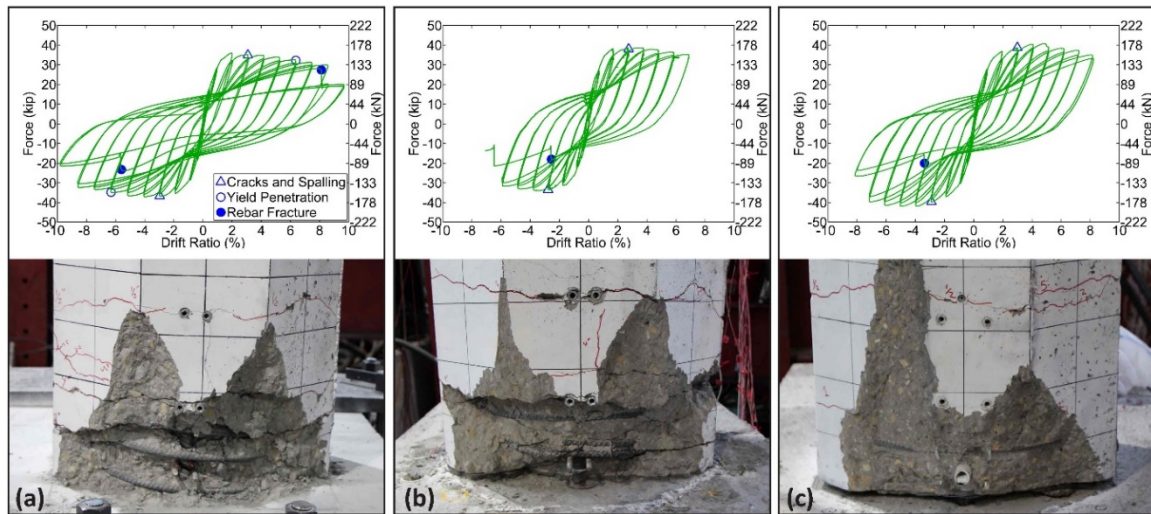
Hysteretic response and damaged zone of specimens: (a) CIP, (b) Precast-1, and (c) Precast-2.
